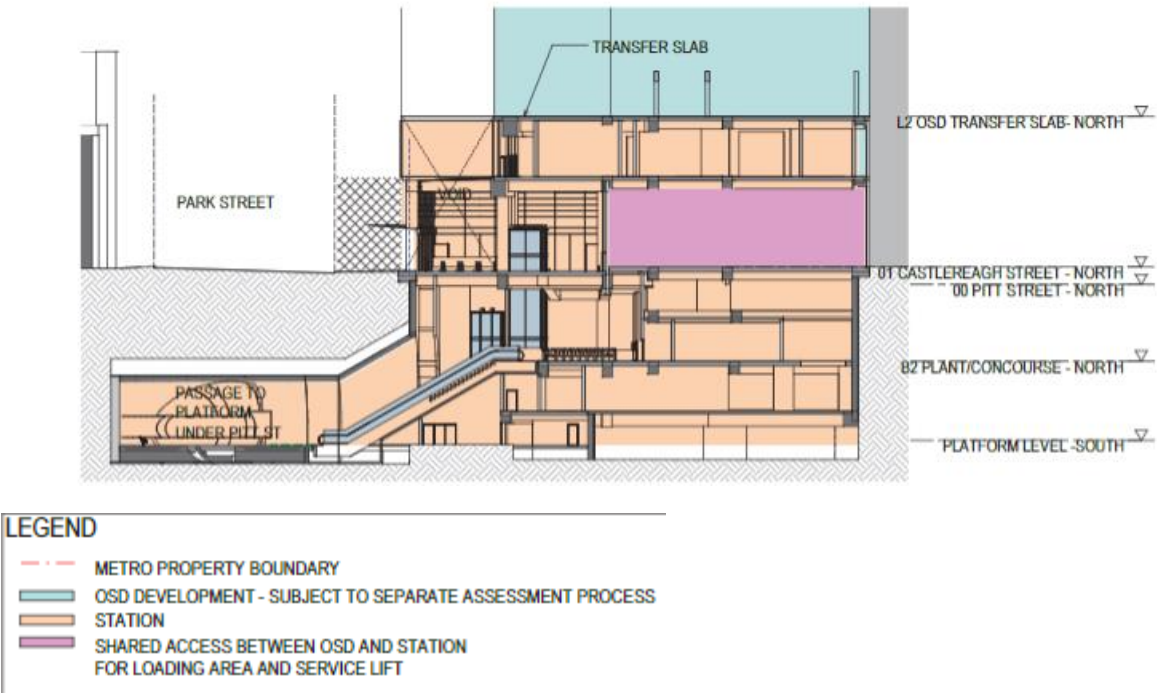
Pitt Street Station – North (North-South Section) (Source: CSSI Preferred Infrastructure Report (TfNSW))
